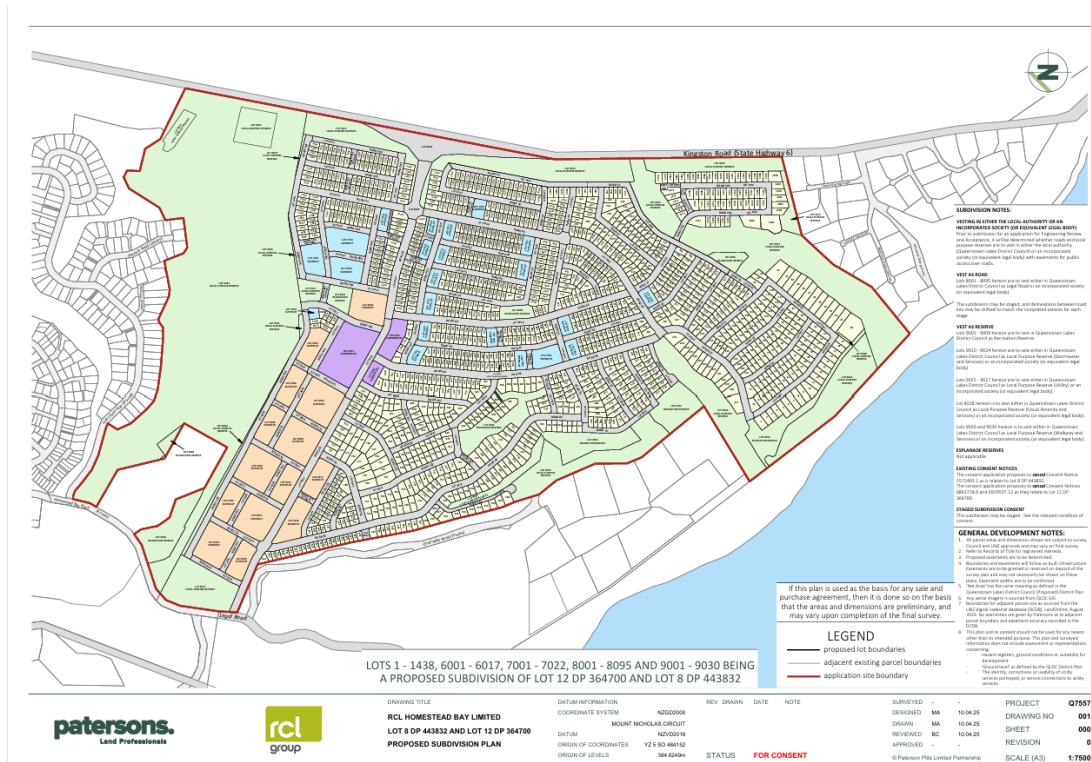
Proposed subdivision plan. Source: Appendix M to Application.
